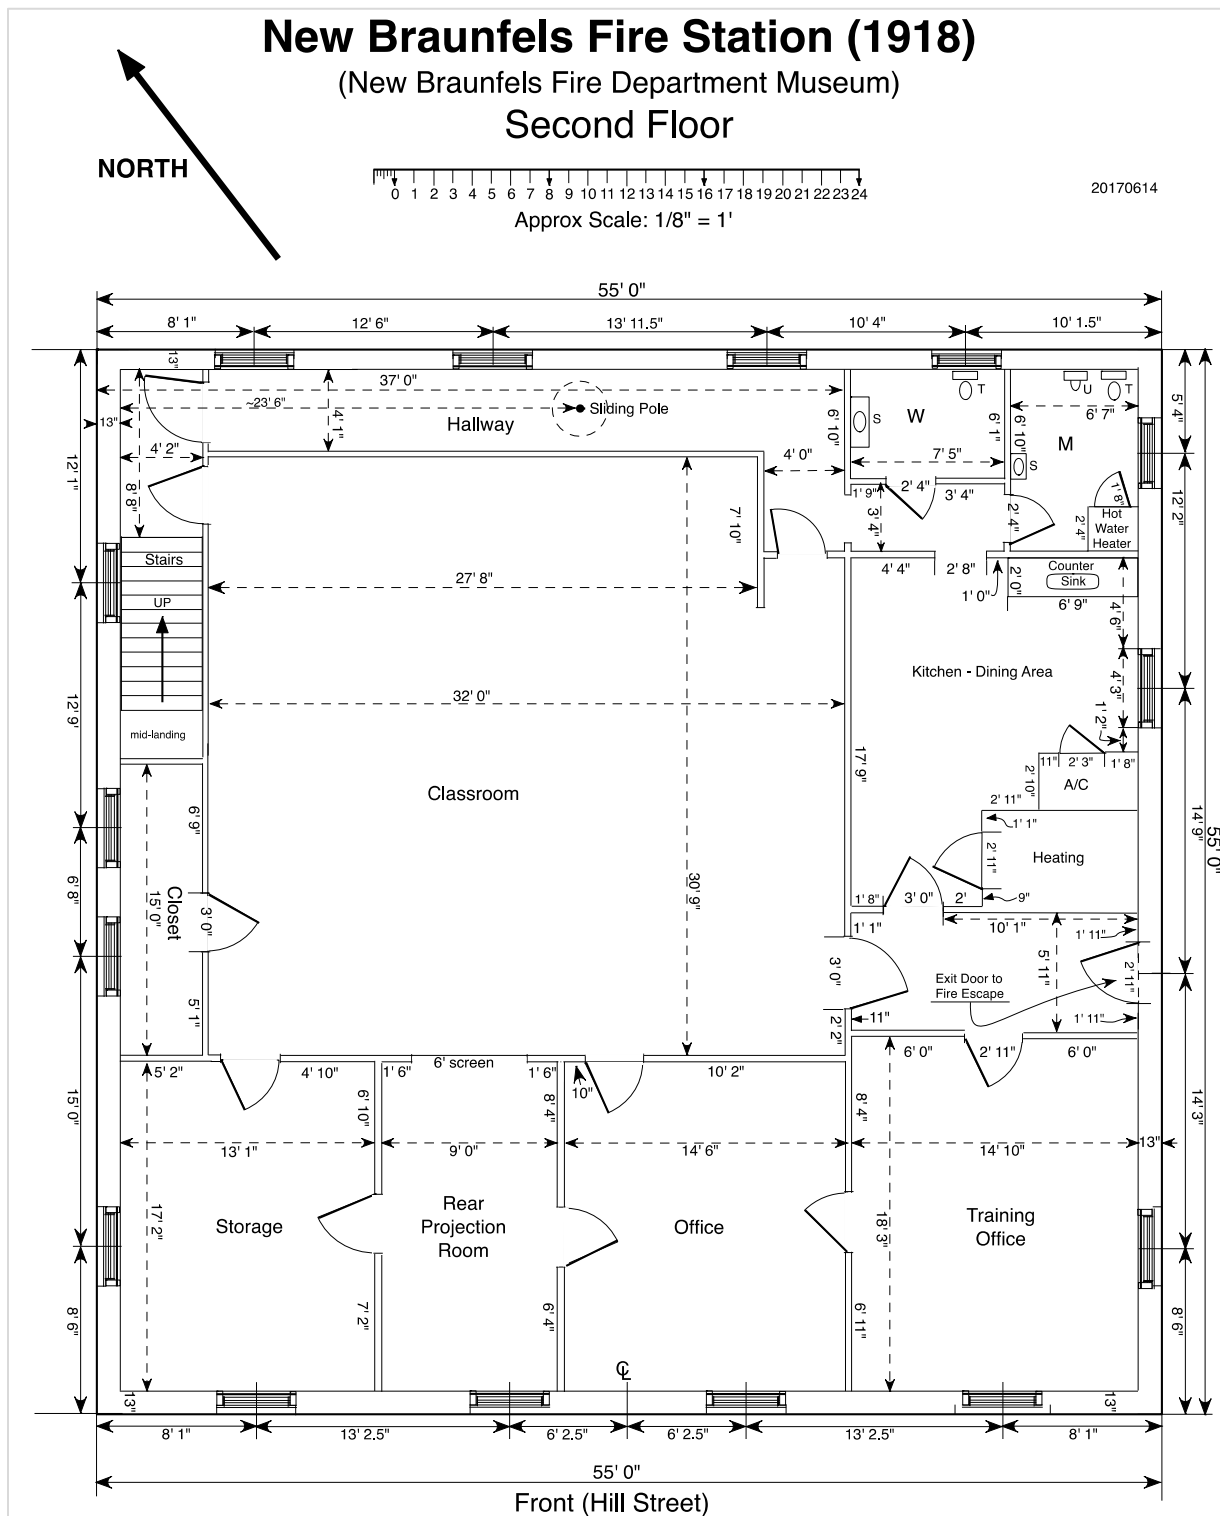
Blueprint of the second-floor configuration of the New Braunfels Central Fire Station, after renovations to expand the training and classroom space. Courtesy of the New Braunfels Fire Museum.
